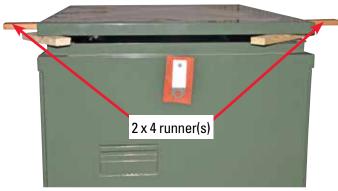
2x4 runner boards are installed to aid in removal of the roof and are normally installed in the direction the roof will be moved.
